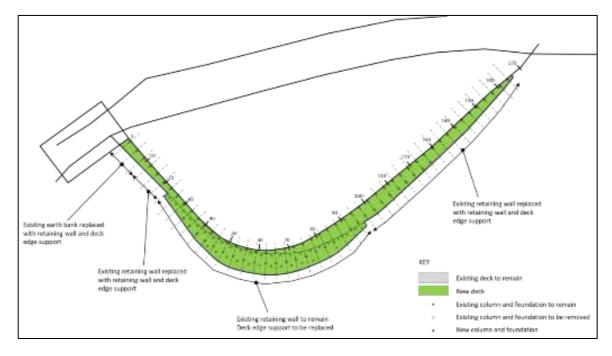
Illustration of proposed stilt structure supporting the Longbridge SLTL.
